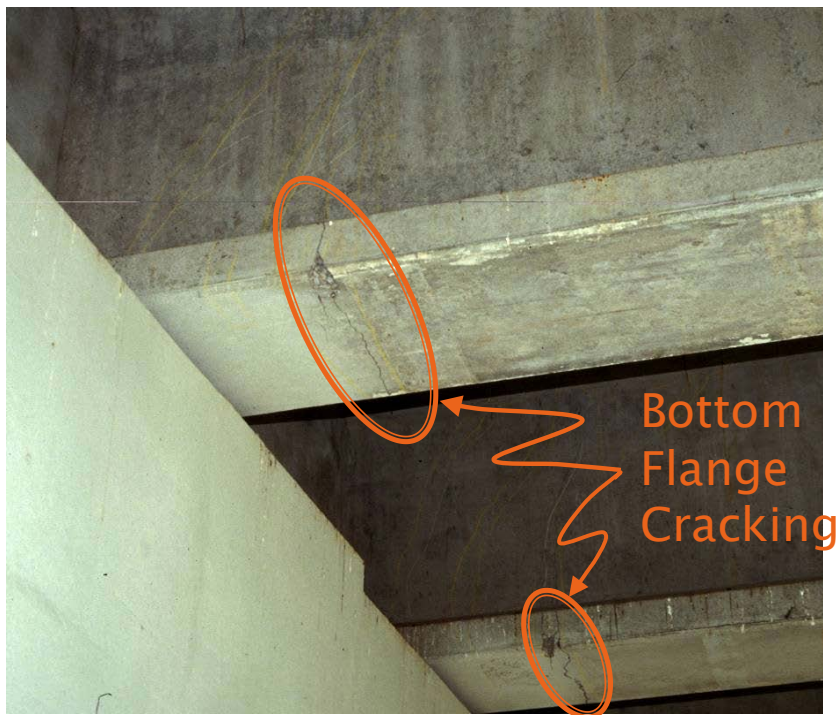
Cracked pre-tensioned bulb-tee girders of I-565 (Barnes et al. 2006)
